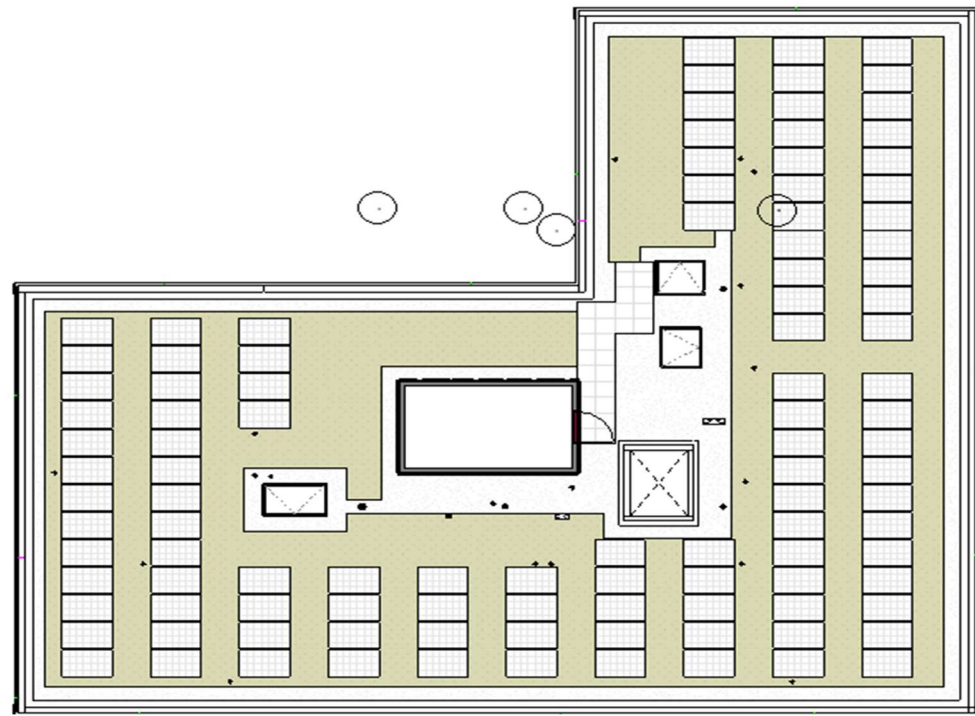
Roof plan showing available maintenance access to each panel and plant room-PRP ⁽³⁾
